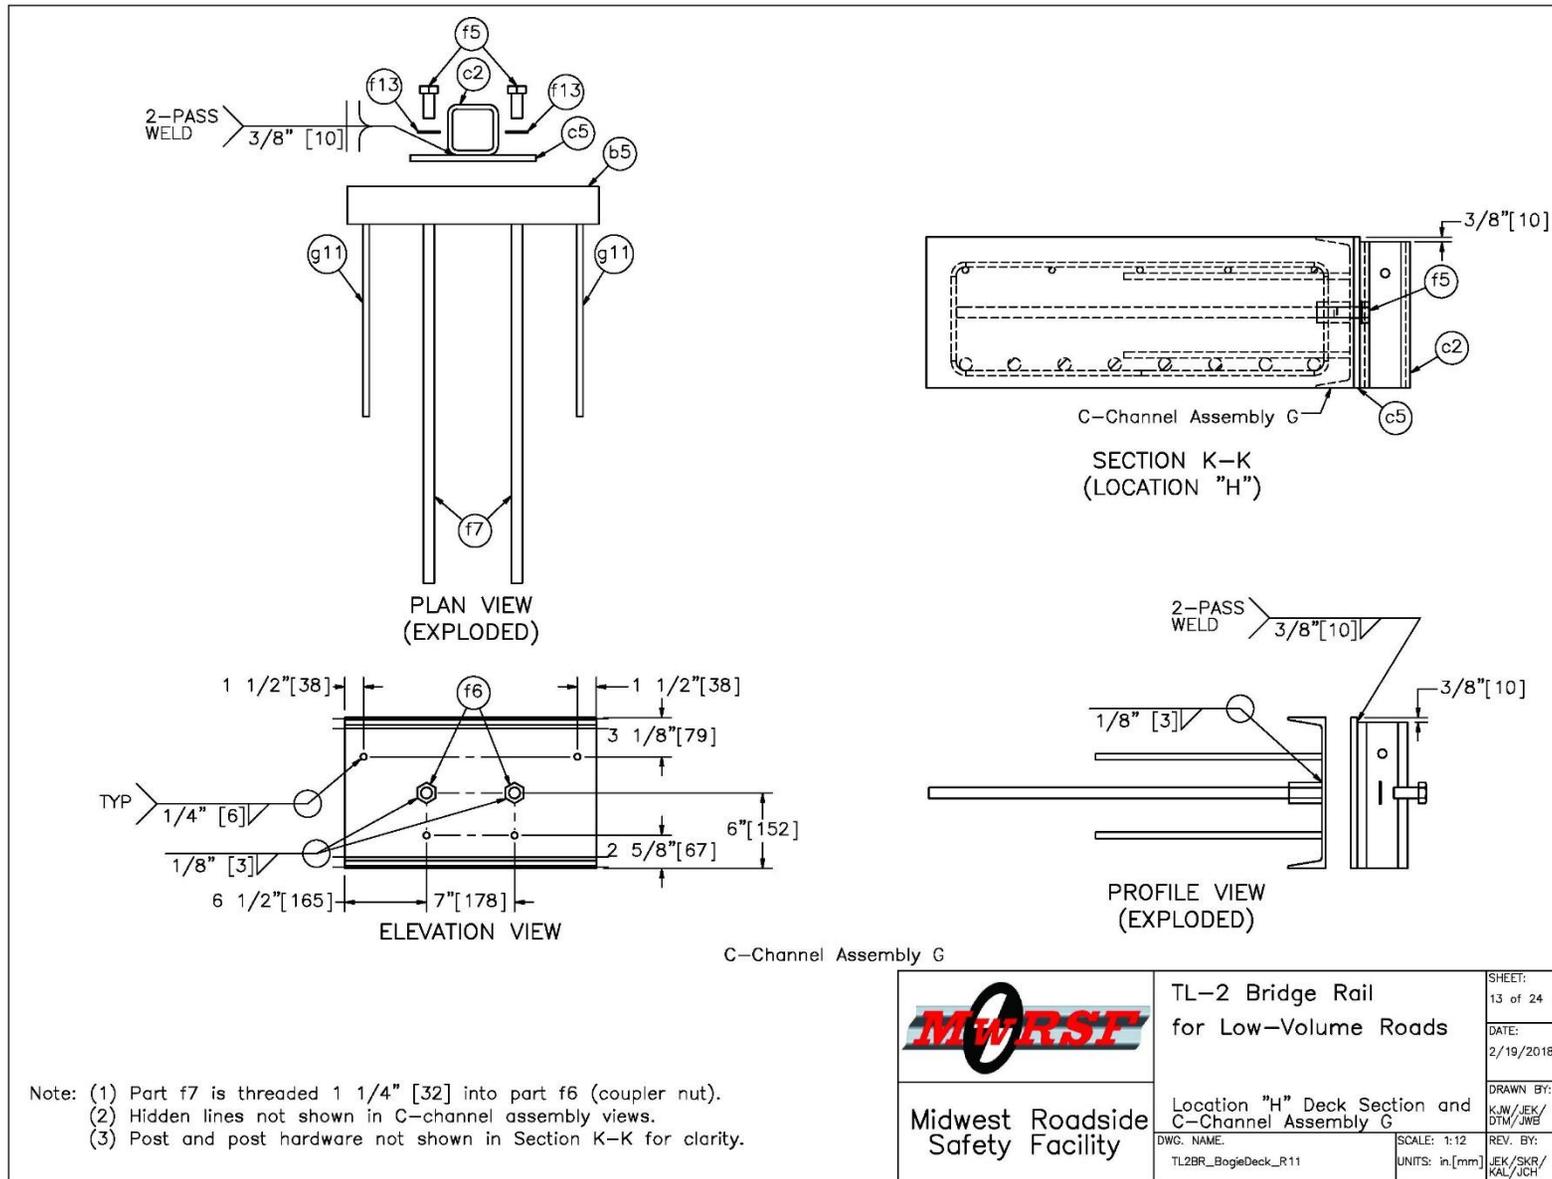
Bogie Testing Matrix and Setup, Location "H" Deck Section and C-Channel Assembly G
